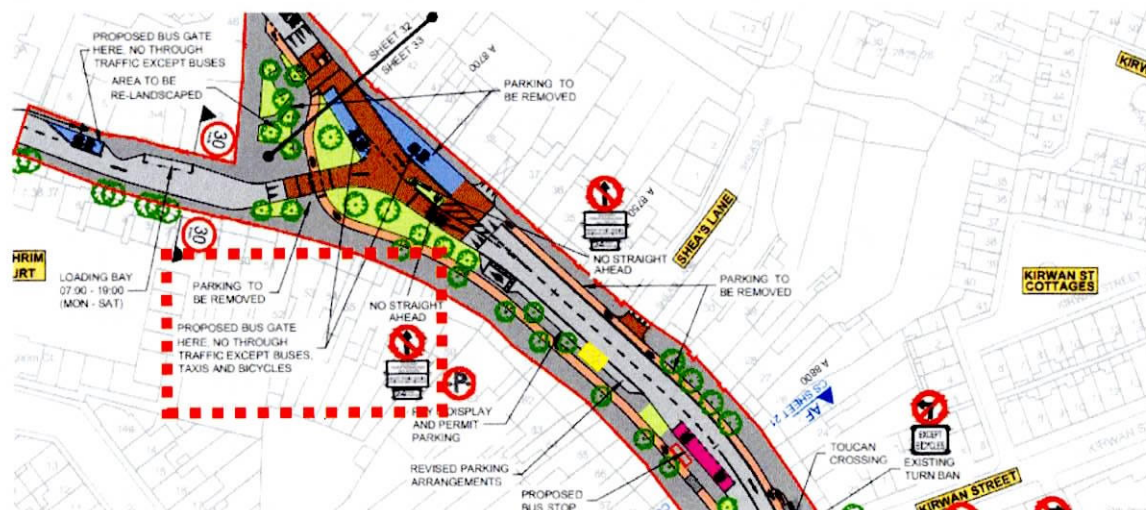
Extract from Sheet 33 of the General Arrangement drawing illustrating the proposed bus gate (red dashed line) at the junction of Prussia Street and Aughrim Street.
